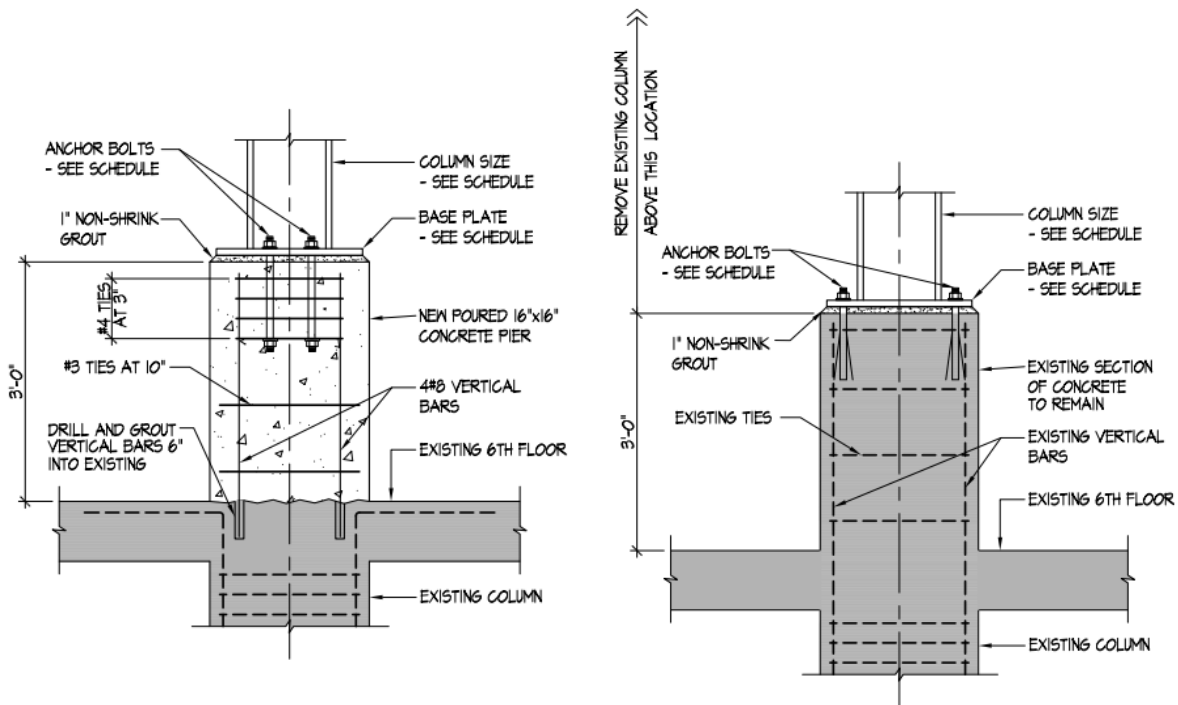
Column Base Typical Detail – New Pier (Left) and Existing Pier (Right), 3 & 4 on S/4.01
